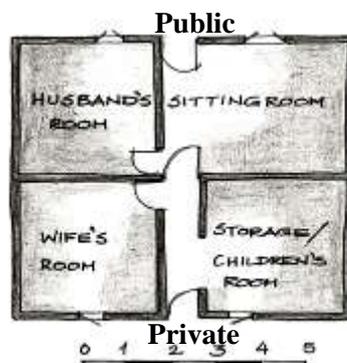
The floor plan of the house in figure 1, Mbuya. (Sketch: Nnaggenda-Musana, 2004).
